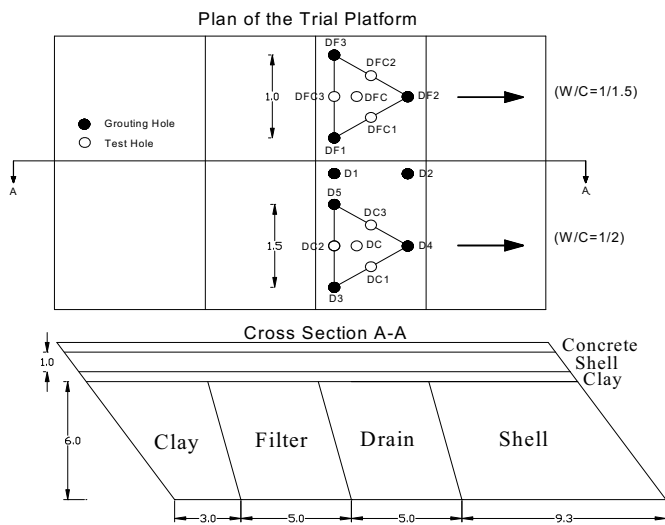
Plan and a cross section of the trial platform for grouting of drain. Dimensions are in meters
